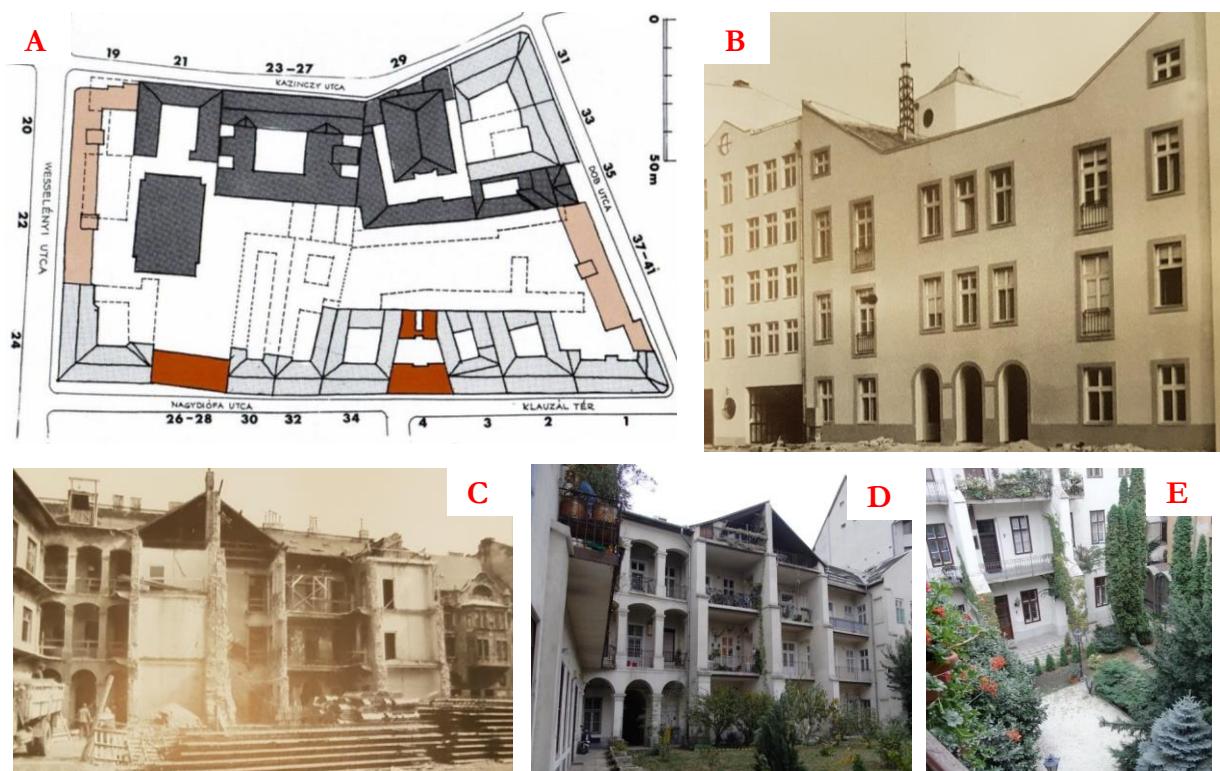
Previous rehabilitation in the case study area: Sample Block Nr 15. A: The demolished wings are marked with dashed line. The new buildings are coloured. The darker shade buildings are renovated institutions. B: Archive photo about the new windows opened on the firewalls. C: Archive photo of the demolition of the inner wings. D: Contemporary photo of the same wings as shown on C. New terraces were created instead of the courtyard wings. E: New green garden in a courtyard where the wings were demolished. Source of A is (Locsmárdi, 2008) B and C (Lampel & Lampel, 1998) D, E: source: Authors' own figure
